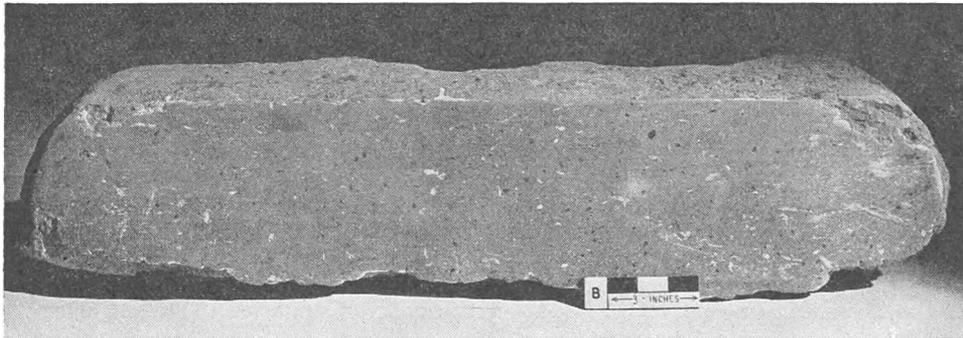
Cross-section of clay-cement pavement after three passes of mixing machine. Mixing efficiency, 60 per cent.
